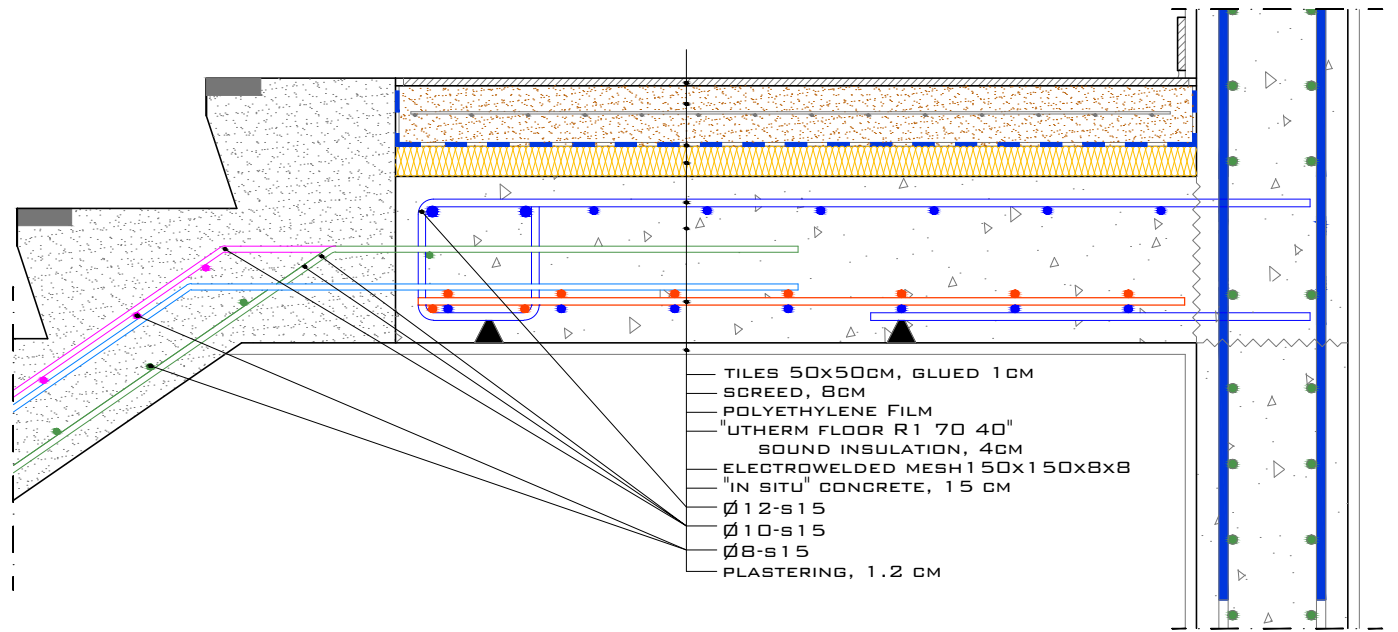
UNION STAIR-FOUNDATION \_ S:1/10
